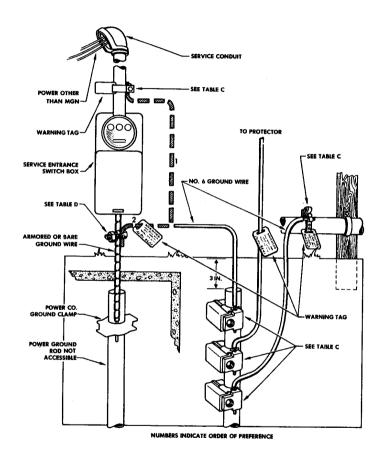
Power Other than MGN Grounded to In accessible Ground Rod—Unacceptable Interior Water Pipe
